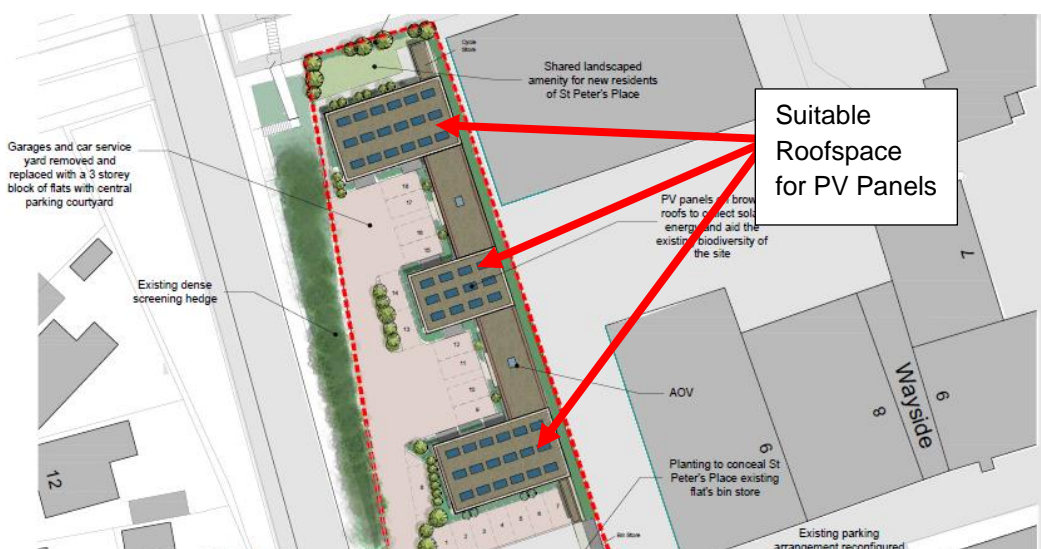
Proposed Roof Plan Illustrating PV Locations
